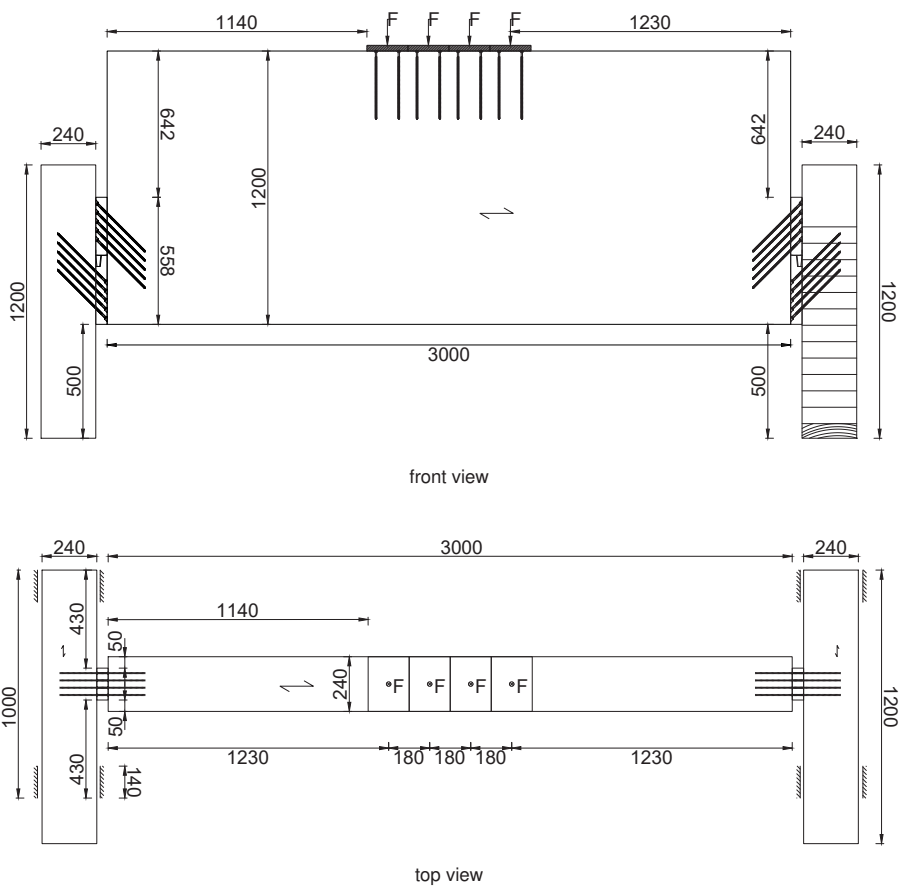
Test specimens for main beam to secondary beam tests with connector v3.
